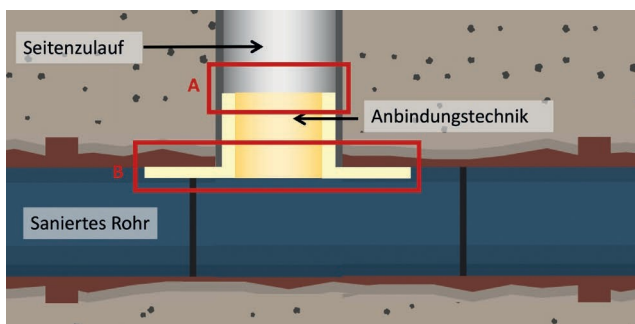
Connection of lateral sewers in trenchless construction from the inside.
